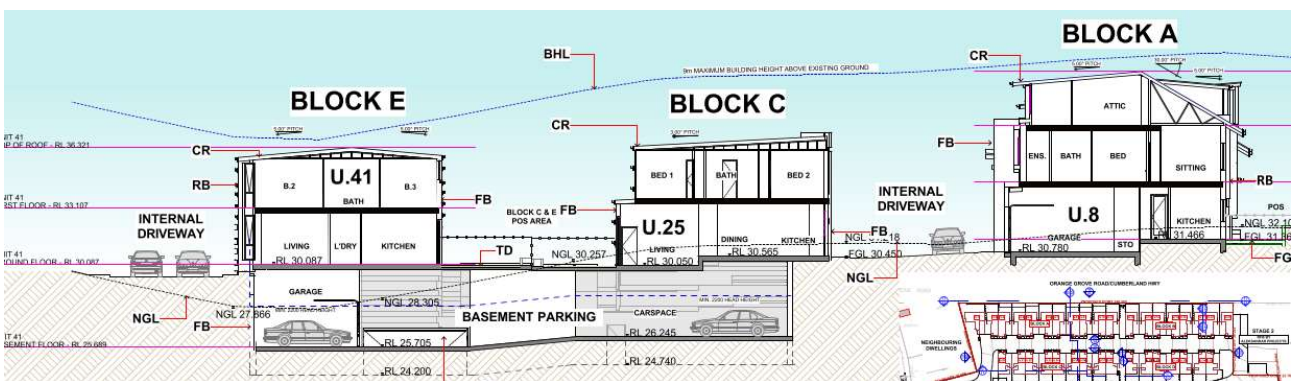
Proposed Section to illustrate the basement below Block C and Block E.
